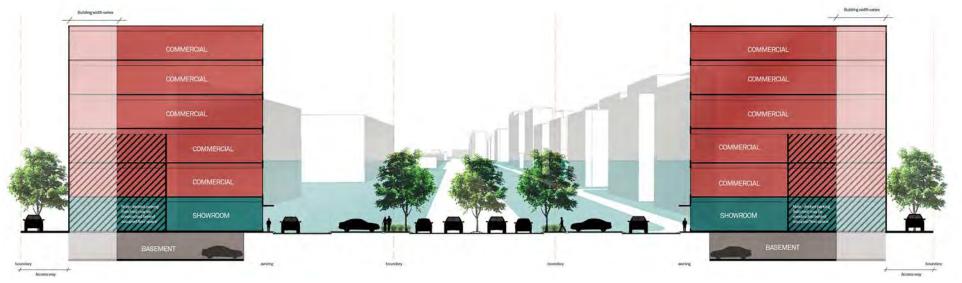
A typical cross section of the Entry Streets precinct showing building setbacks, height, car parking and street characteristics
